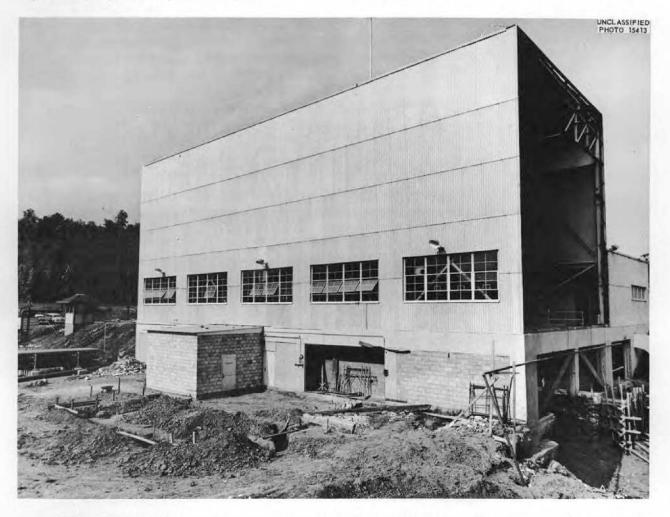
View of Building 7503 from the Southwest. Photograph taken during the early stages of construction, showing the portion of the building which existed at the start of construction of the ART facility.
